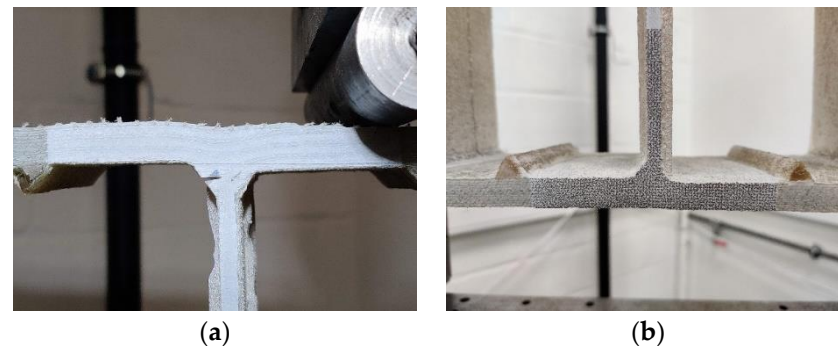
(a) Close-up of the top flange–web intersection with crack initiation and a white base coat for online microscopy; (b) close-up of the bottom flange–web intersection with a DIC speckle pattern (right), a reverse combination is also possible.
